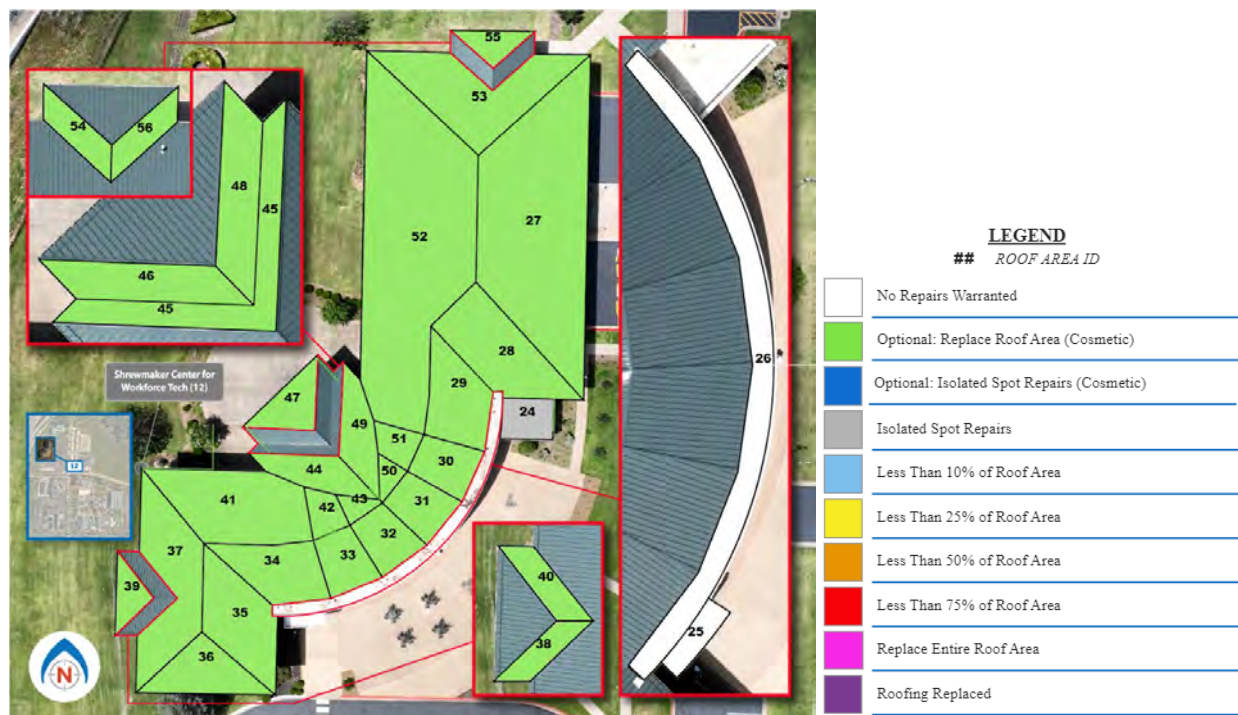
Excerpt of SAM Q-PDF<sup>®</sup> that depicts the minimum roofing repairs by color.
